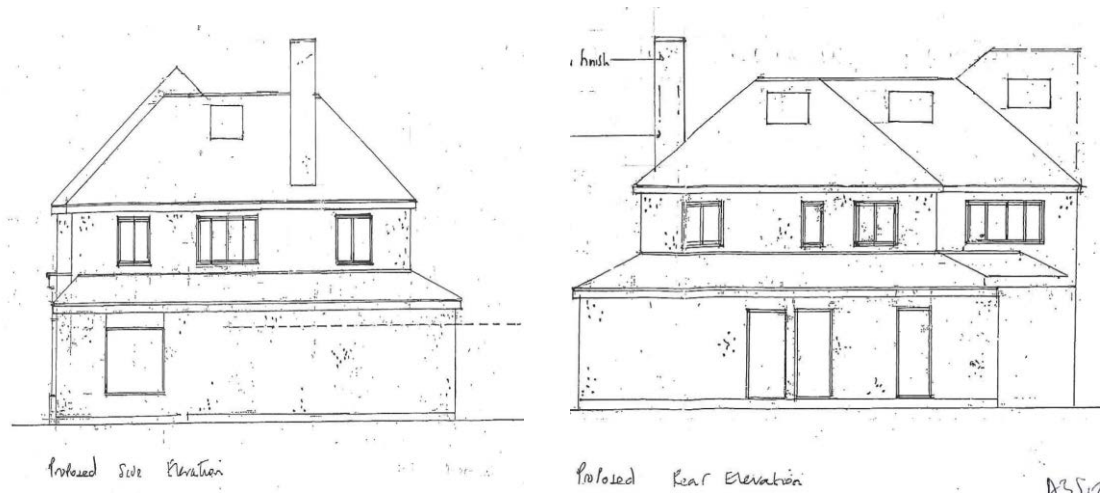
Proposed side and rear elevations to No. 126 Billesley Lane
